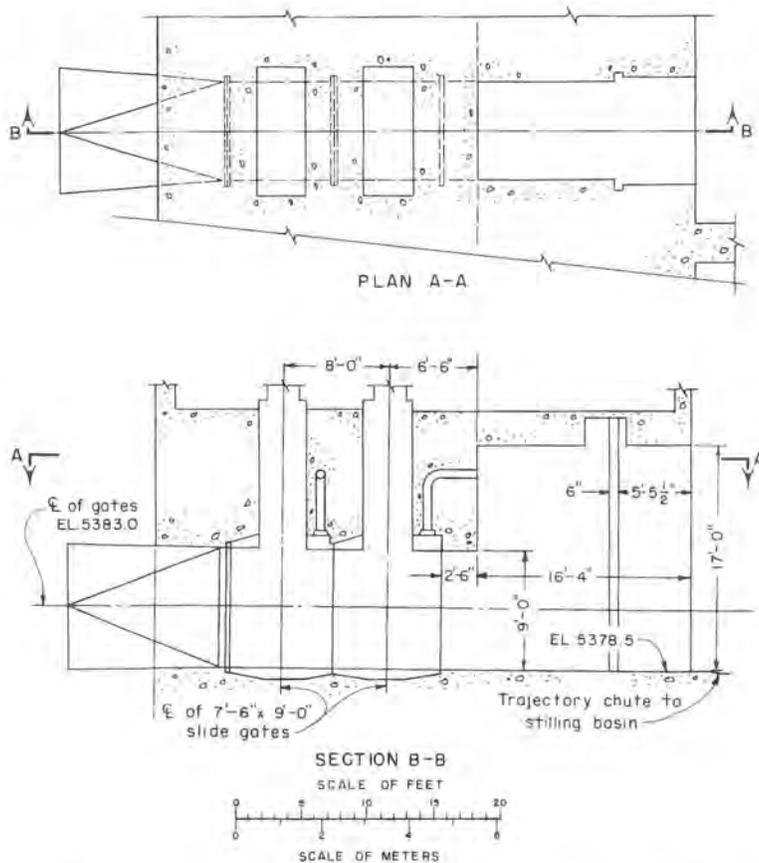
Palisades Dam Existing Outlet Works Gate and Tunnel
